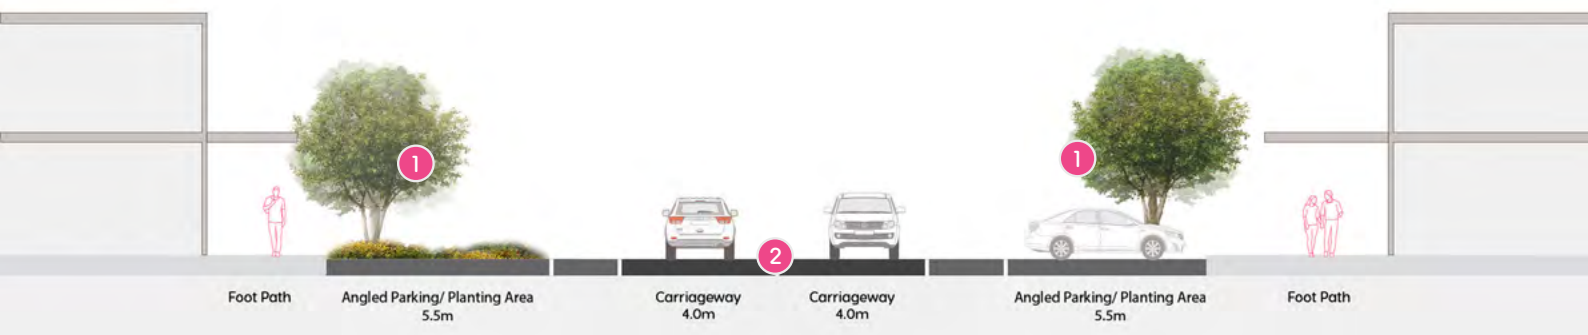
Proposed upgrades in Wilson Street - Typical Section
